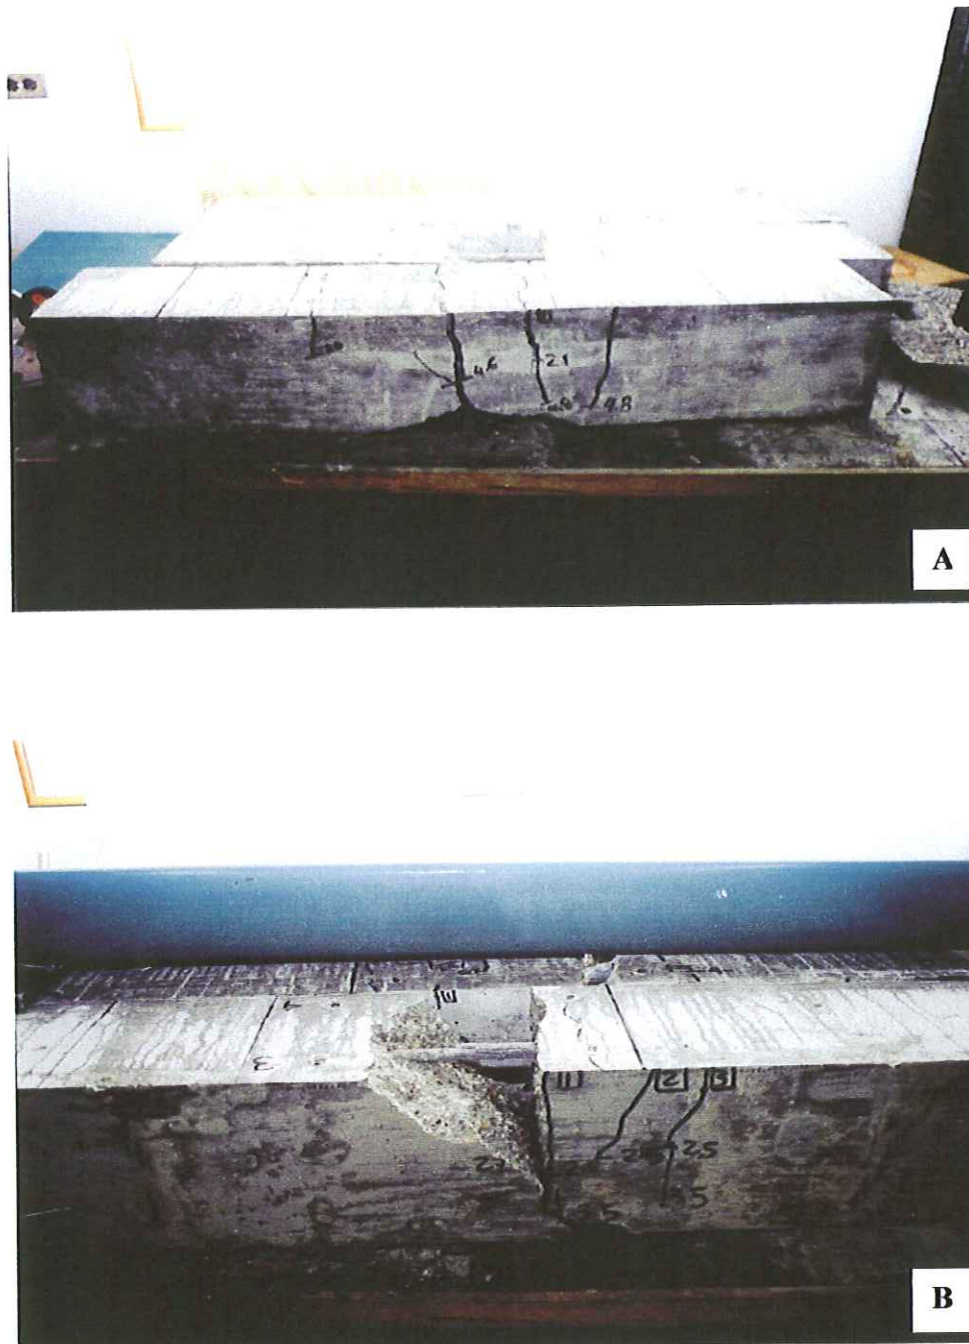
Typical crack pattern and failure modes in reinforced concrete beams tested in second trial: A) Crushing of concrete and B) Rupture of reinforcement.
